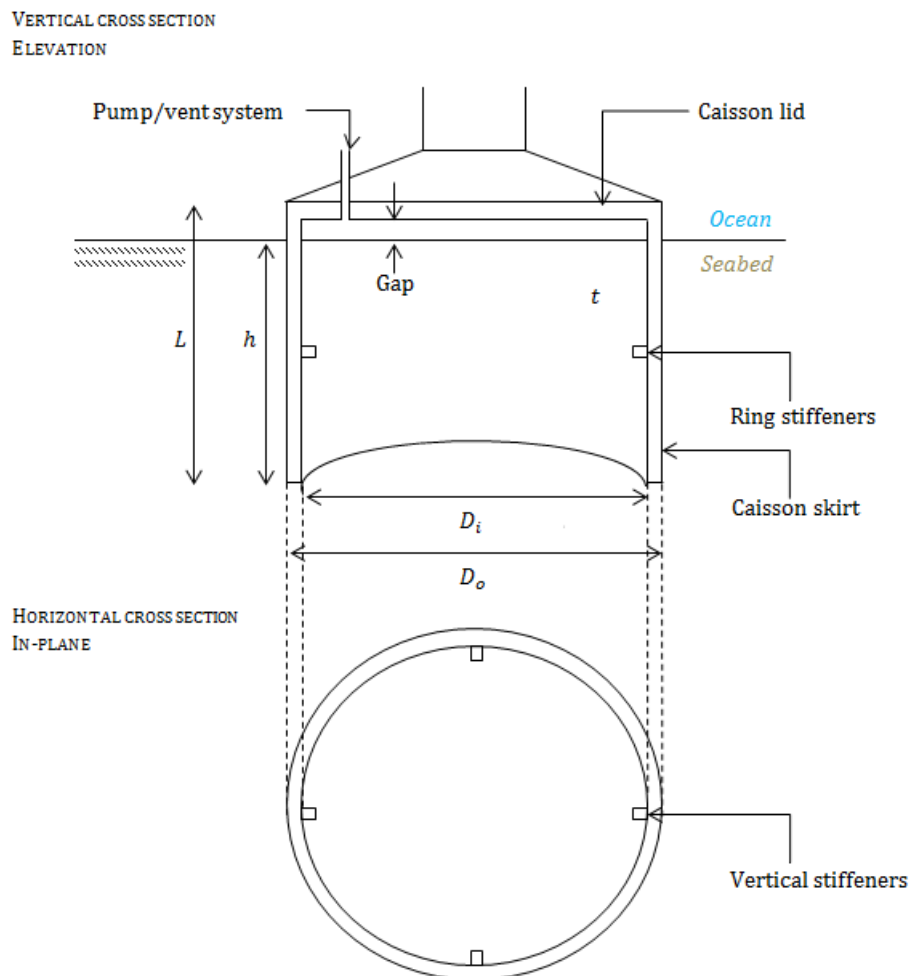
Suction caisson component terminology based on vertical and horizontal cross sections
